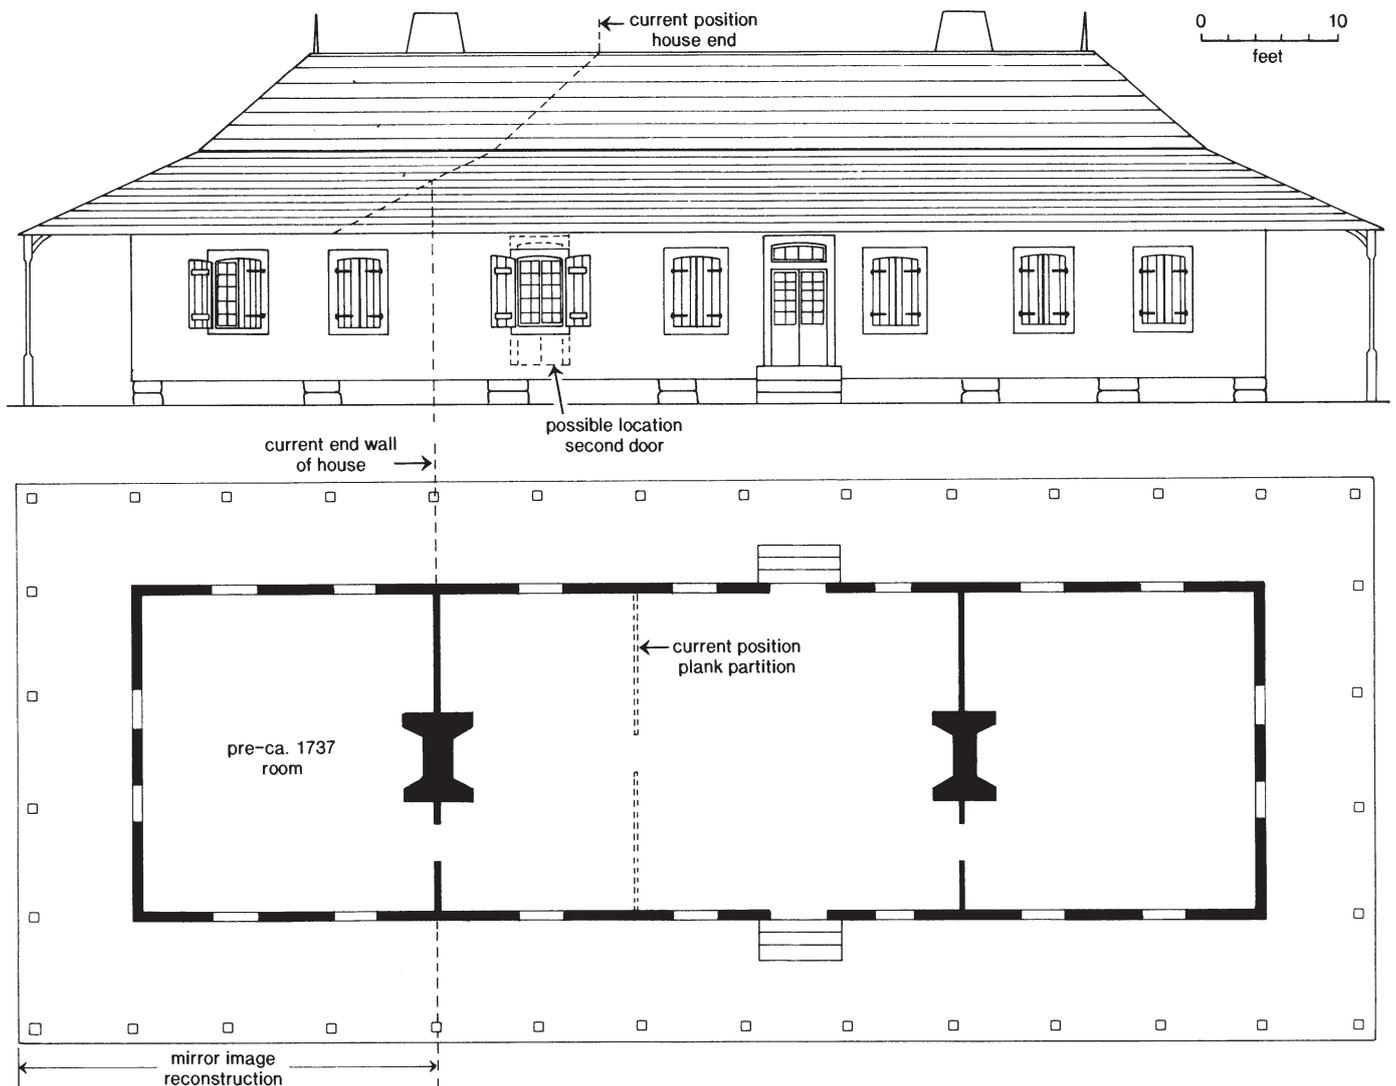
Nicholas LaCour plantation house, originally from Coupée Parish, La., ca. 1733. Source: Edwards, J., (1994).
